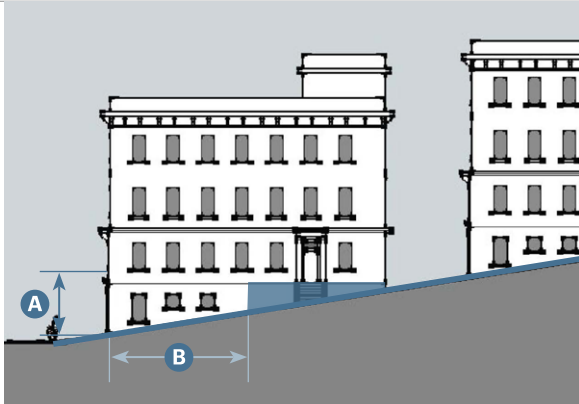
Site Grading for Block-Scale Building Forms
